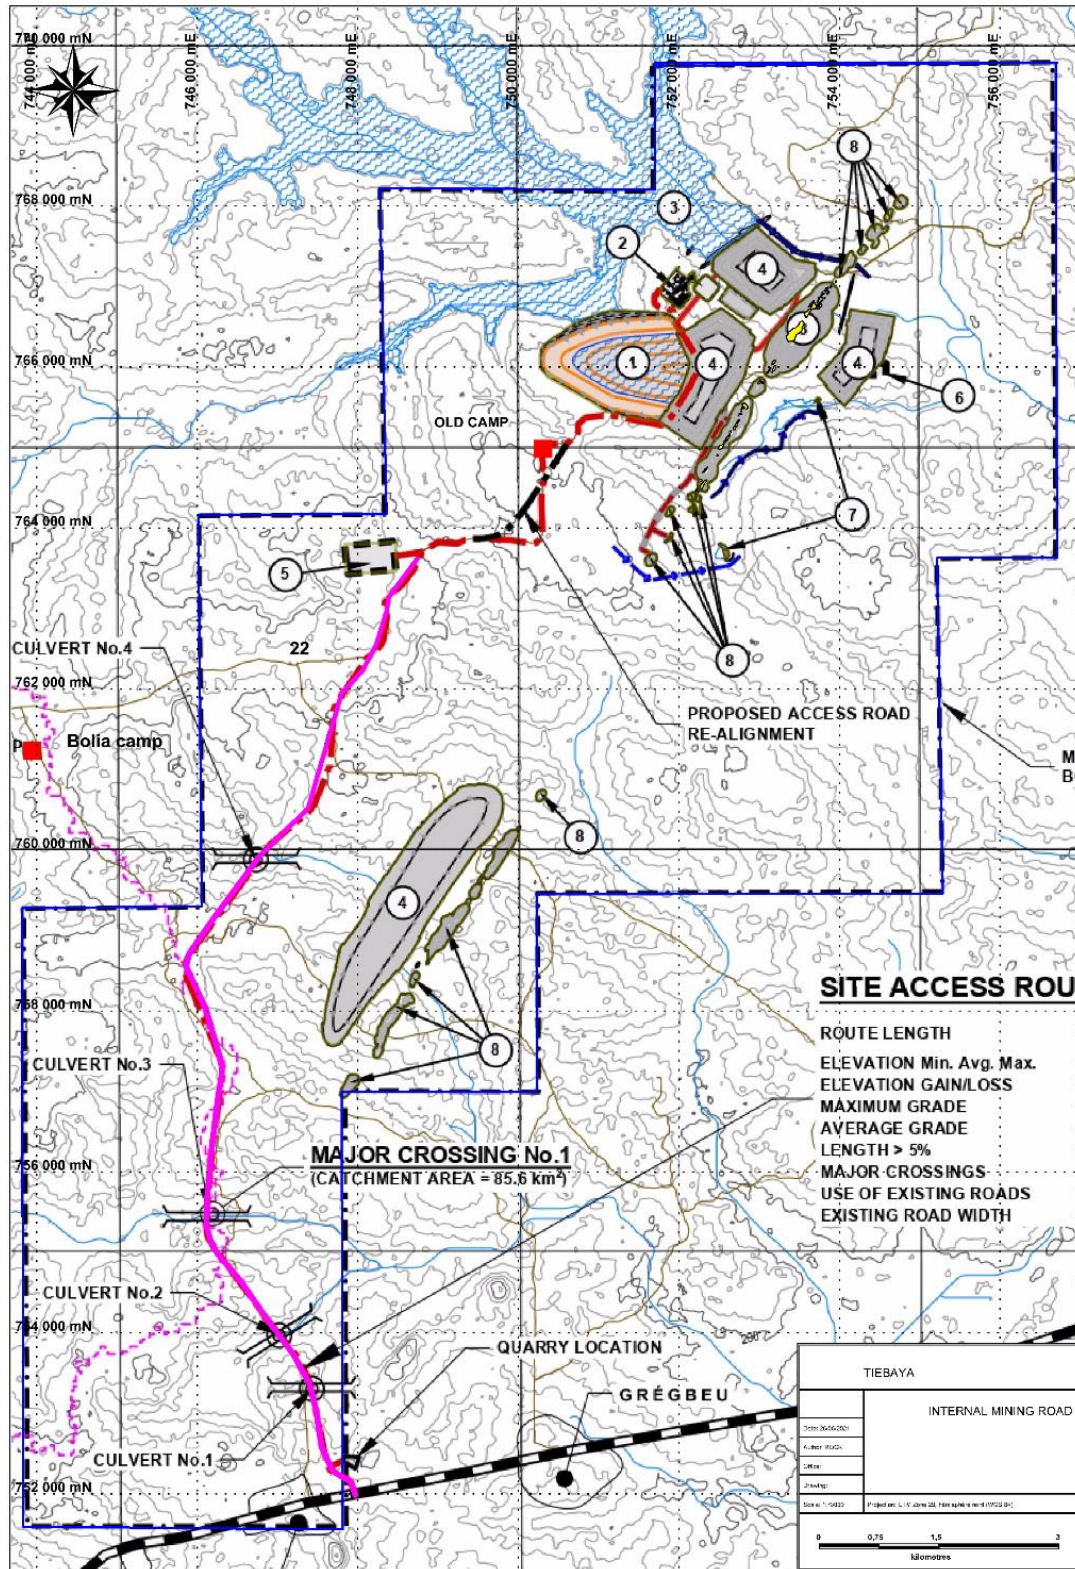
Plan view of the Abujar internal access road, mine layout and national highway (Pink length is constructed, black dash section is yet to be constructed)
